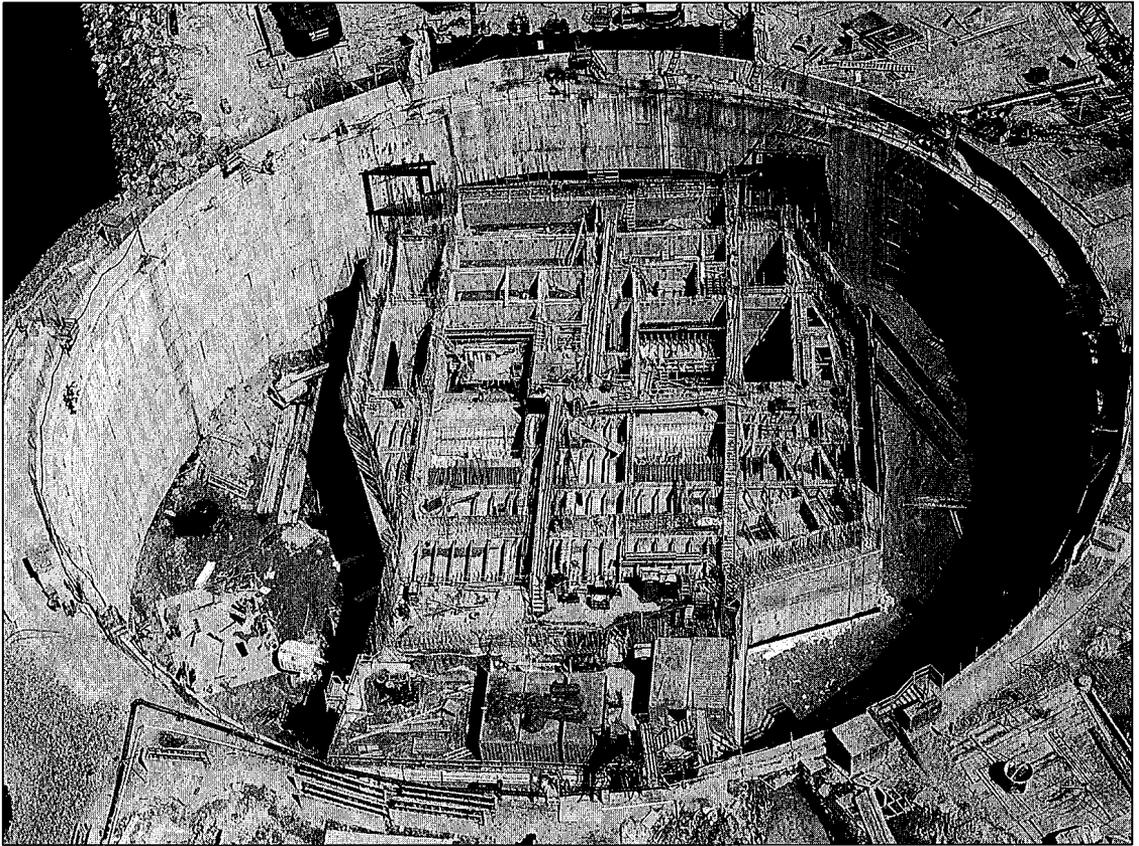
Construction of Ventilation Building No. 6 within the cofferdam.
